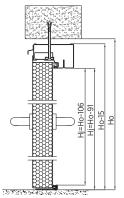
Installation of a double-leaf door to a masonry wall – internal frame with a thermal break – vertical cross-section
